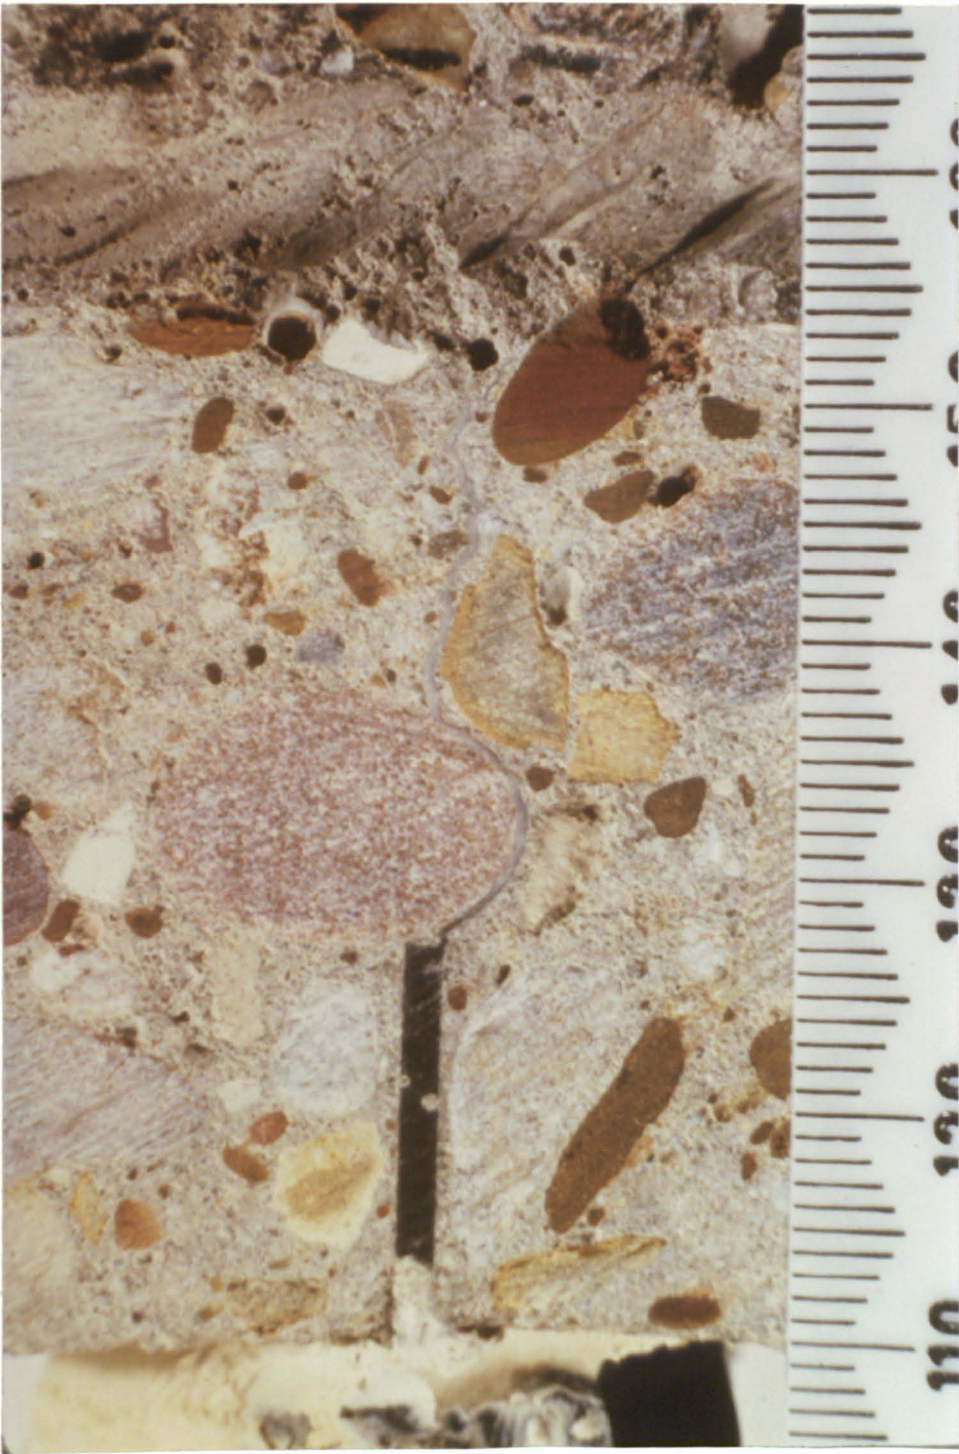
SPECIMEN 6B - INTERNAL CRACK,
